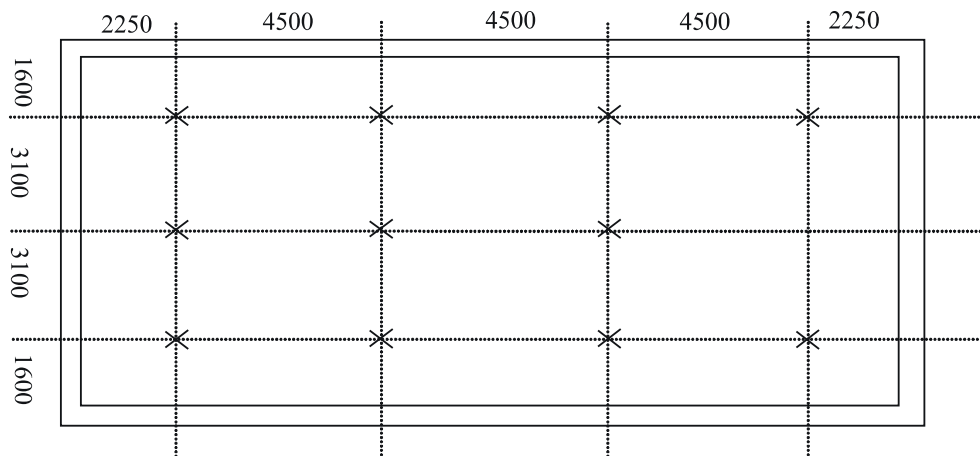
Typical slab configuration showing test positions (Not to scale)
